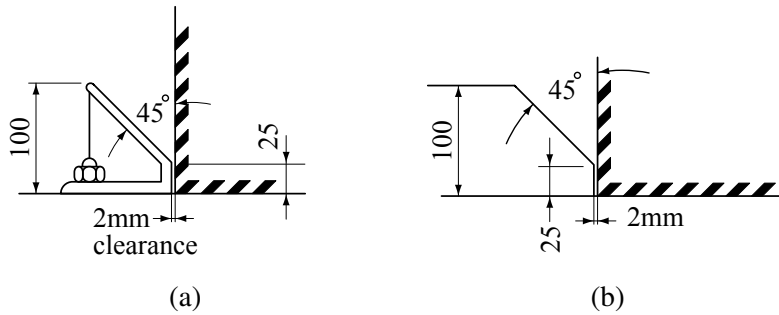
Possible details of the lead-rubber bearing at column footing. (a) On flat foundation and (b) in recess in foundation.
